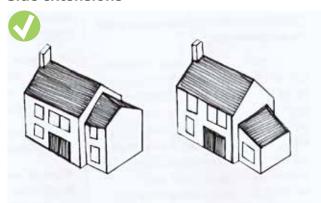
Sympathetic side extensions, respecting existing building scale, massing and building line.
